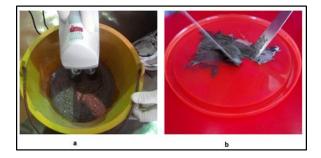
Mixing process of Grout A (left) and Grout B (right)
